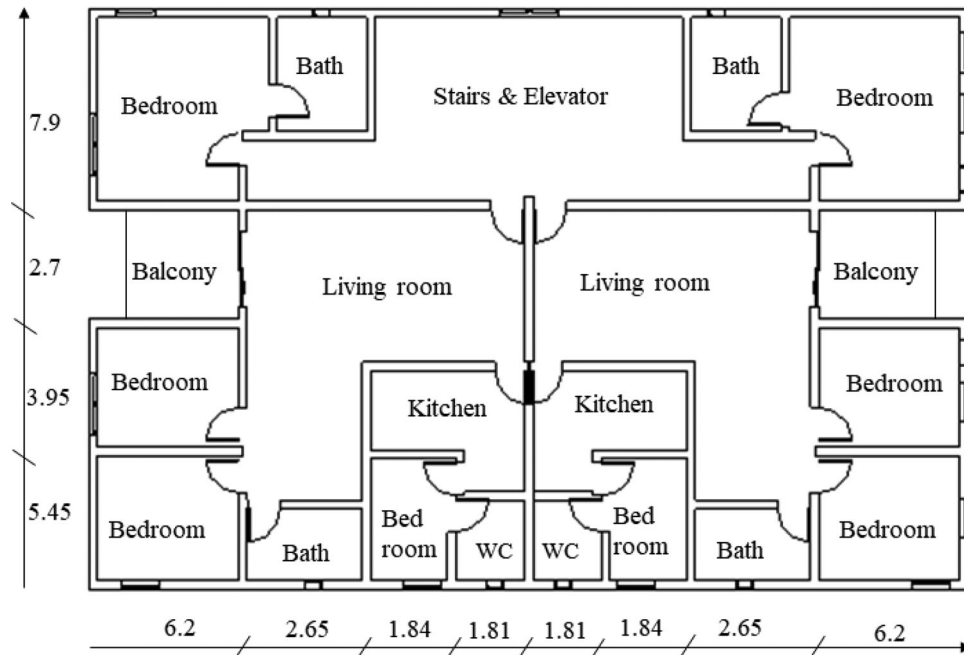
Illustration of the architectural plan of the second floor of the studied residential house.
